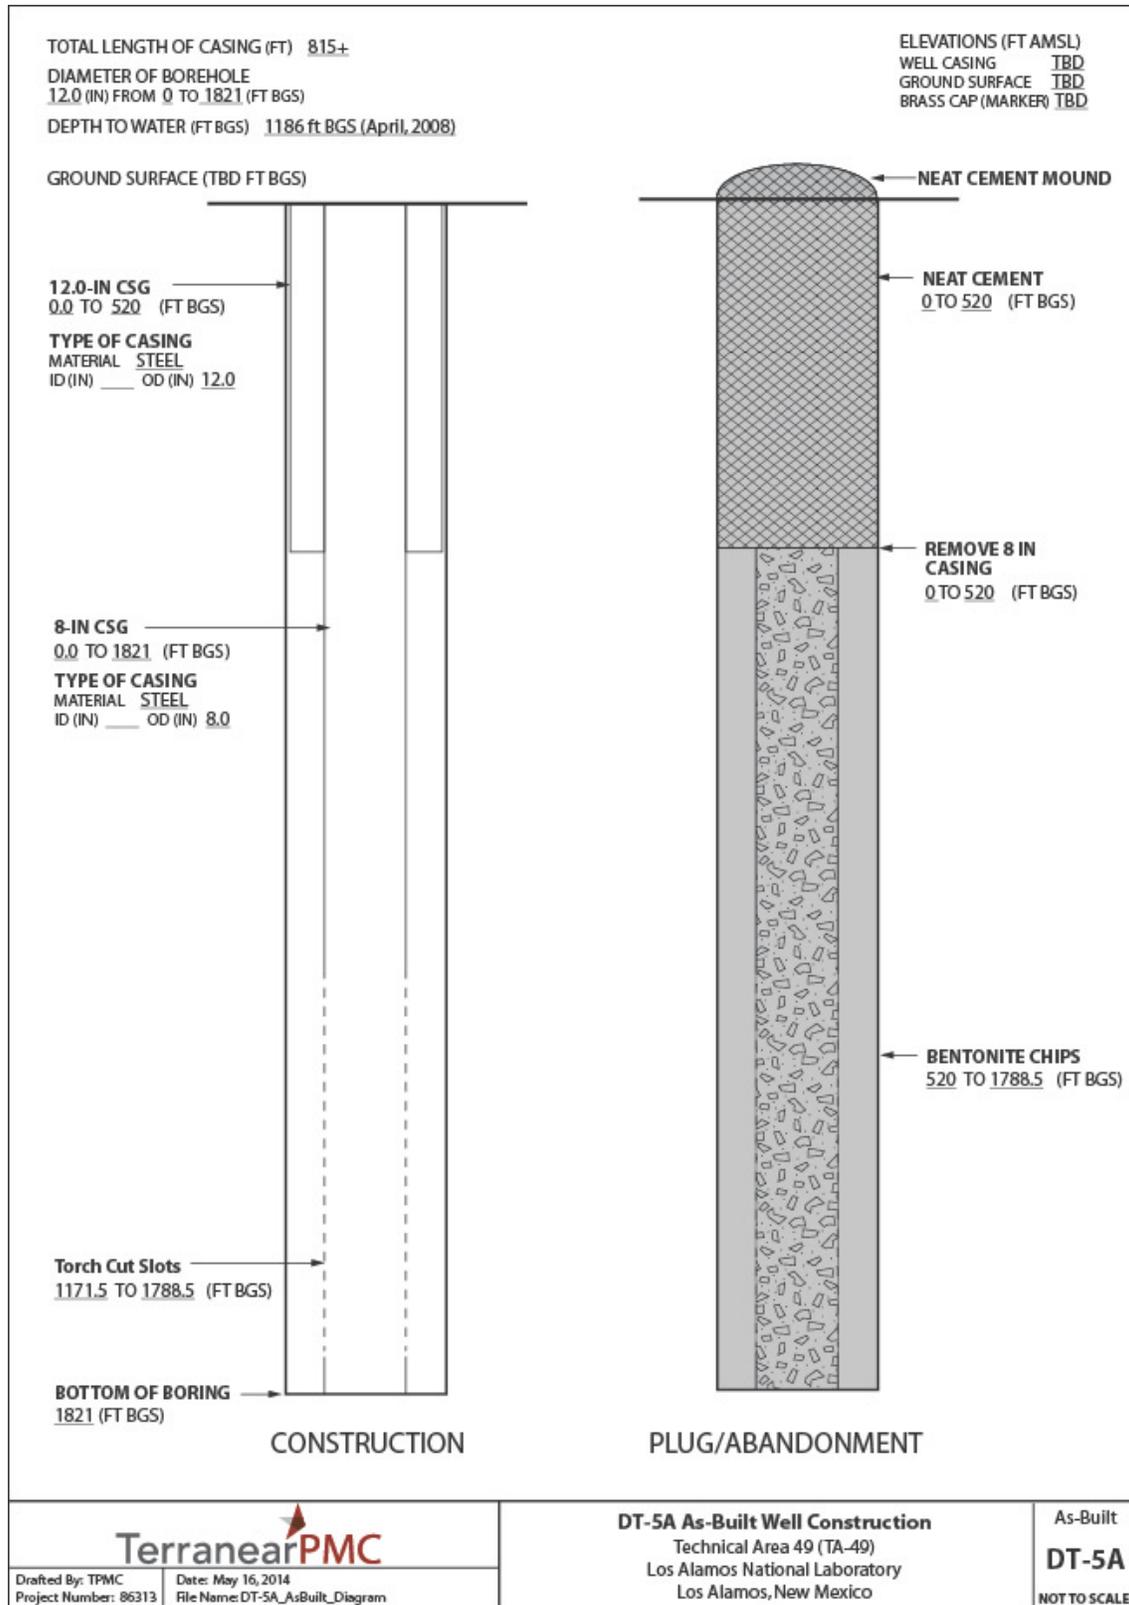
DT-5A Well Construction and Proposed Abandonment
